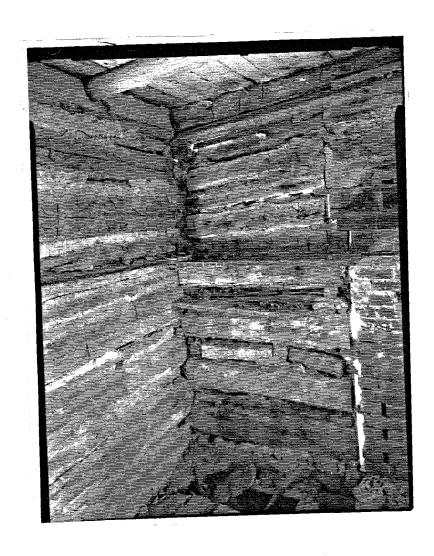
Webb House, first floor: detail of shelves and wall construction in southwest corner, looking southwest.
